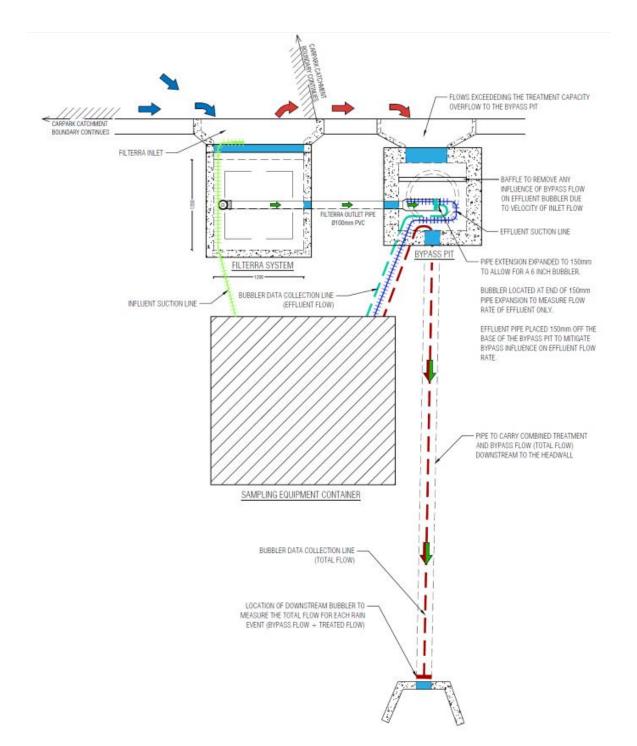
Schematic plan of monitoring site arrangement at Kingswood Campus Carpark, Western Sydney University
